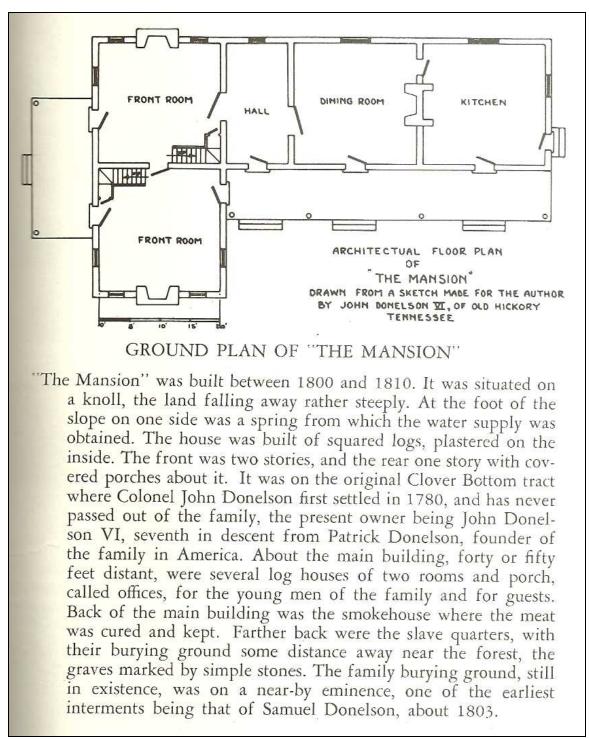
Ground Plan of the Mansion (adapted from Burke, vol. 1, 43).
